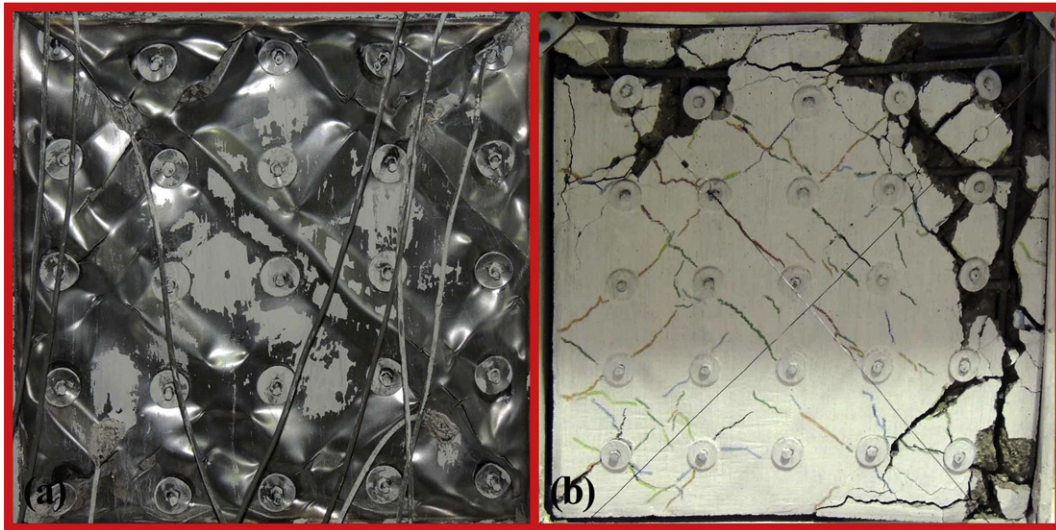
Specimen C-SPSW-L after the test: (a) the infill steel plate (b) the reinforced concrete panel.
